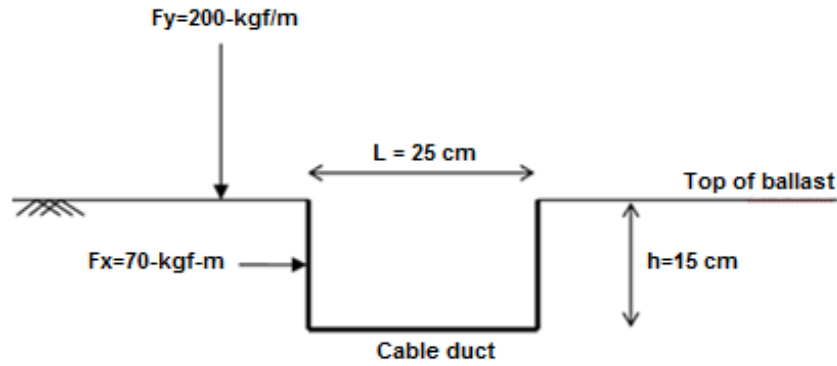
Sketch of the cable duct cross section under the action of lateral design load.
